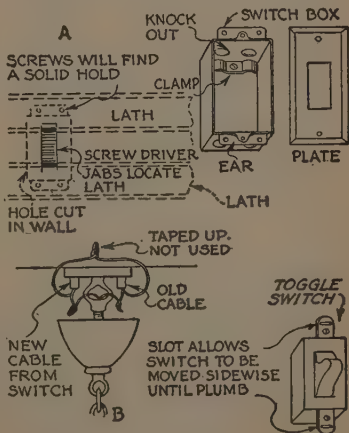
Method of cutting a wall for a switch box; connecting new wires at ceiling outlet.
